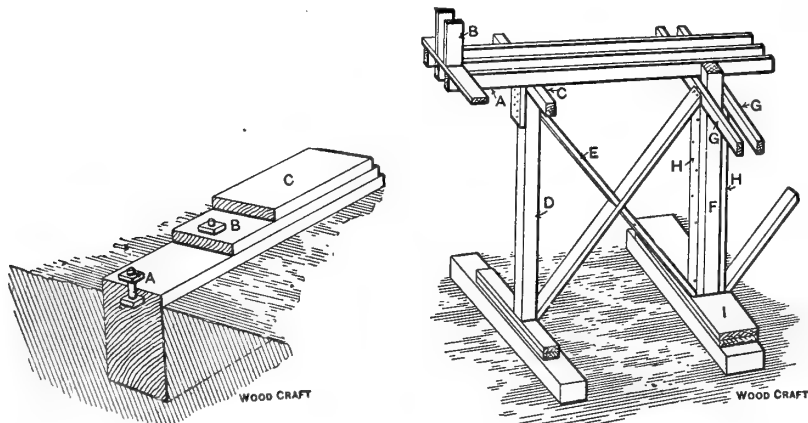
Foundation and Sill Arrangement Fig. 4—Details of Interior Framing
